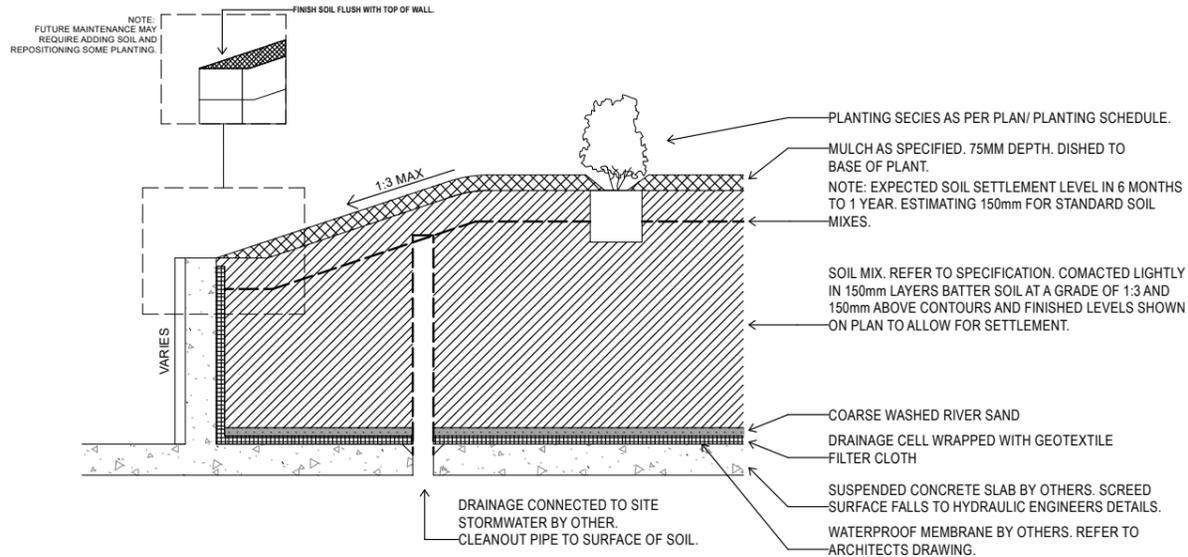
DETAIL: TYPICAL TREE PLANTING ON STRUCTURE
